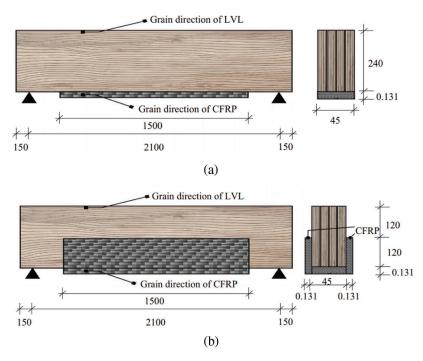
Elevation and cross-section of two strengthening plans [77]: (a) Plan 1; (b) Plan 2. All dimensions are in mm
